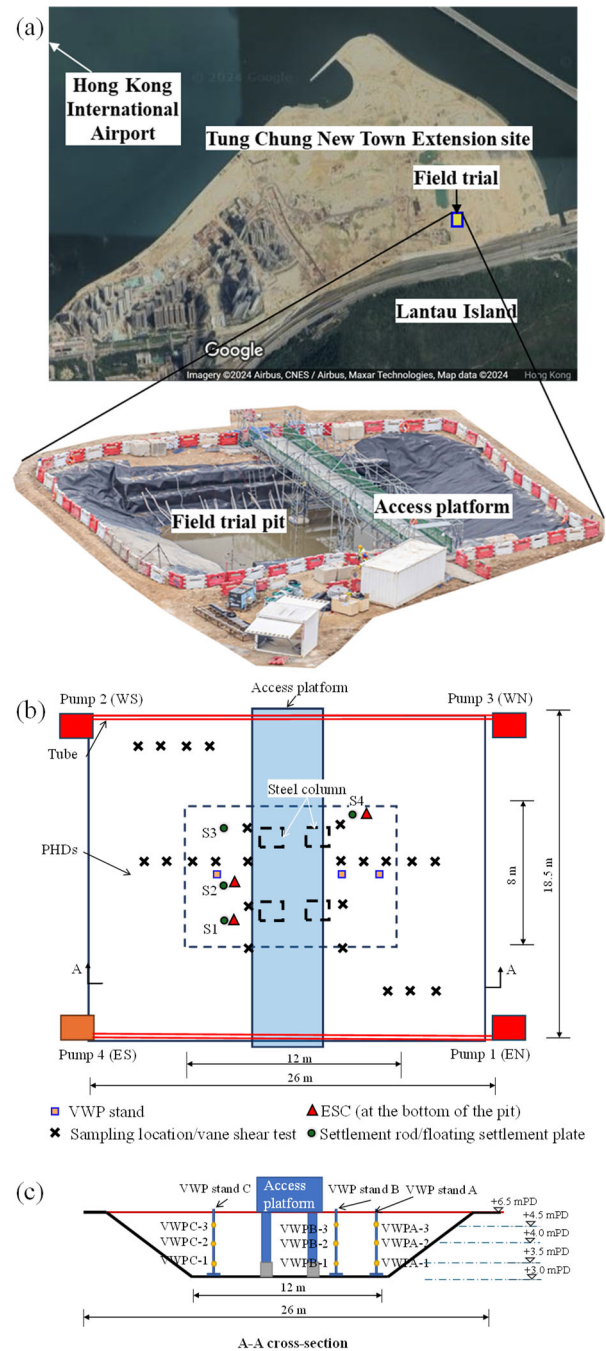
(a) Location; (b) schematic drawing (top view); and (c) A-A cross-section view of the testing pit
